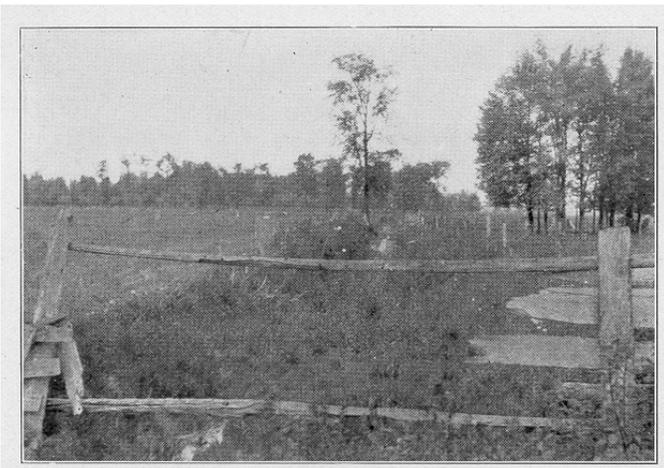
Plate XIII. Fig. 1. Open drain nearly filled in. Contract let for reconstruction with land type dredge.
